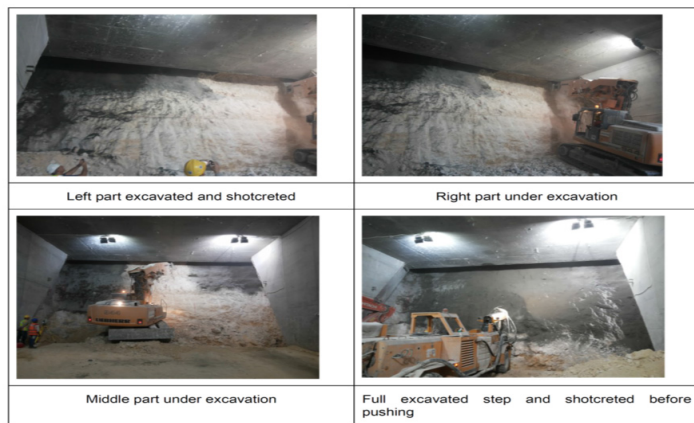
Excavation sequence with shotcrete application to control over-excavation
